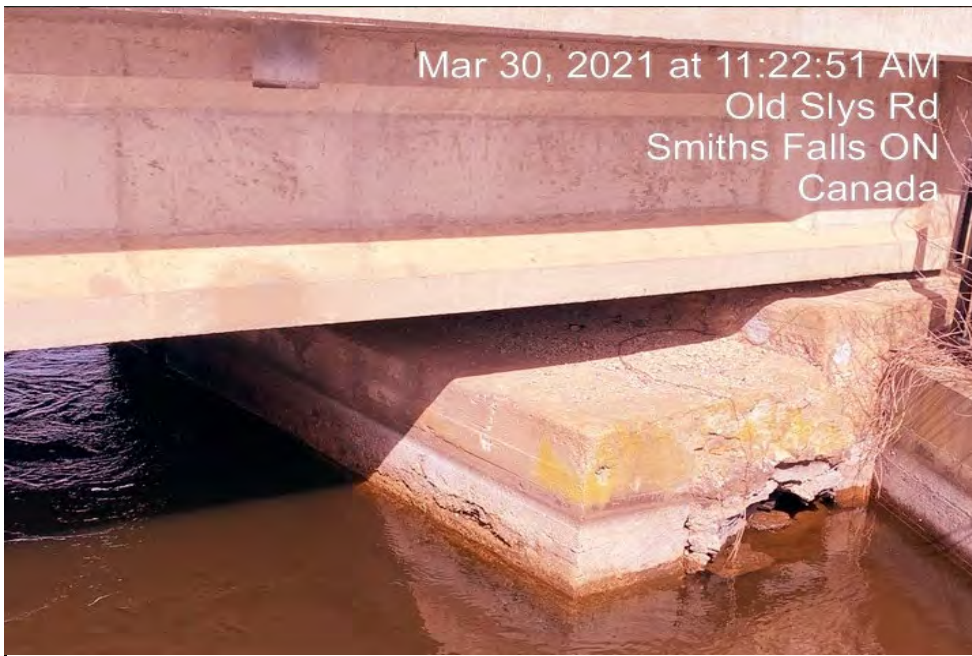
Abutment NE Corner-Spall/Crack
